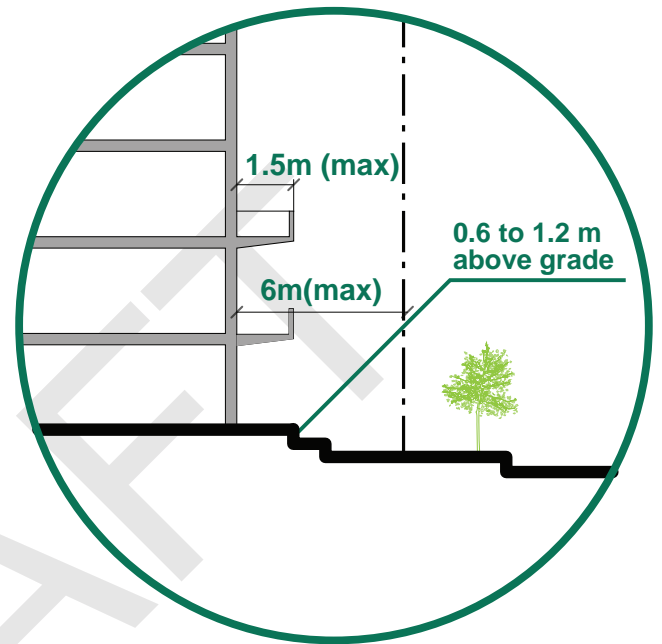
Ground floor conditions on B-Streets. Residential uses are elevated above the ground floor, but directly linked to the public sidewalk through individual points of access serving each unit.
